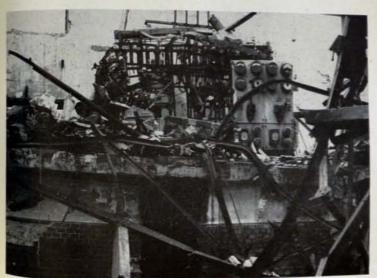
6,700 feet from GZ. Group 39. East end of Turbine room. Damage to roof truss.
